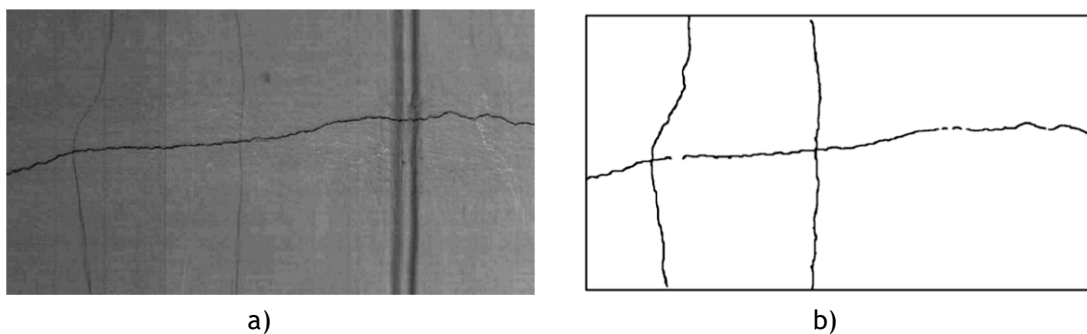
a) image captured on the wall and b) extracted cracks.
